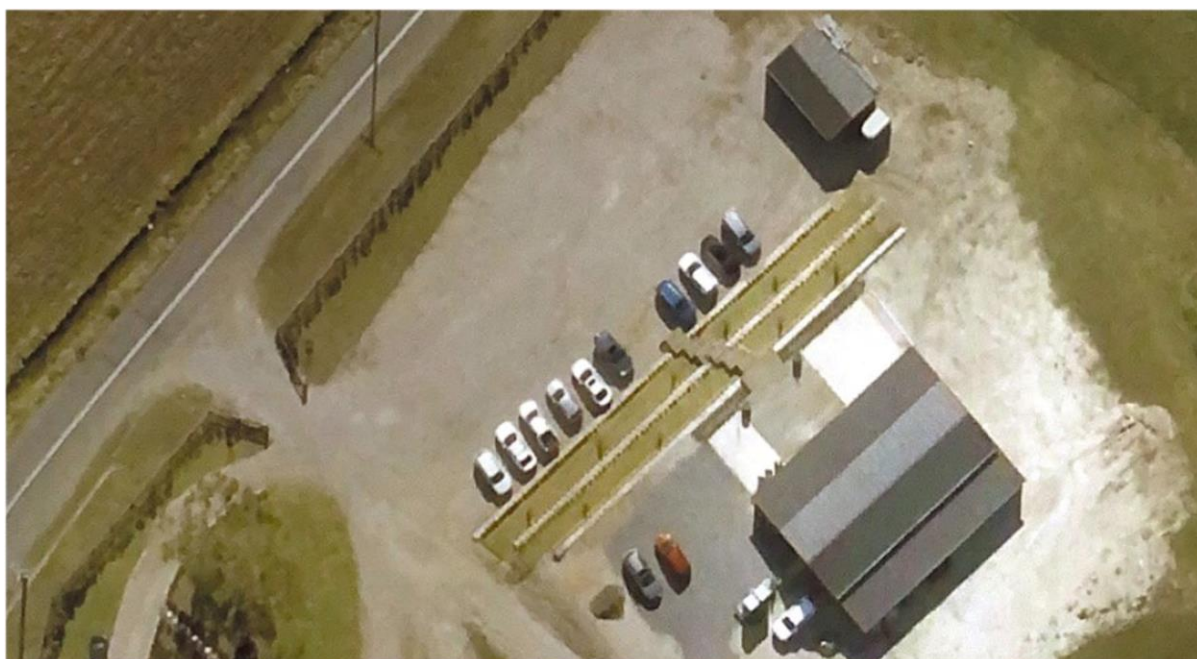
EXISTING CAR PARKING ARRANGEMENTS
